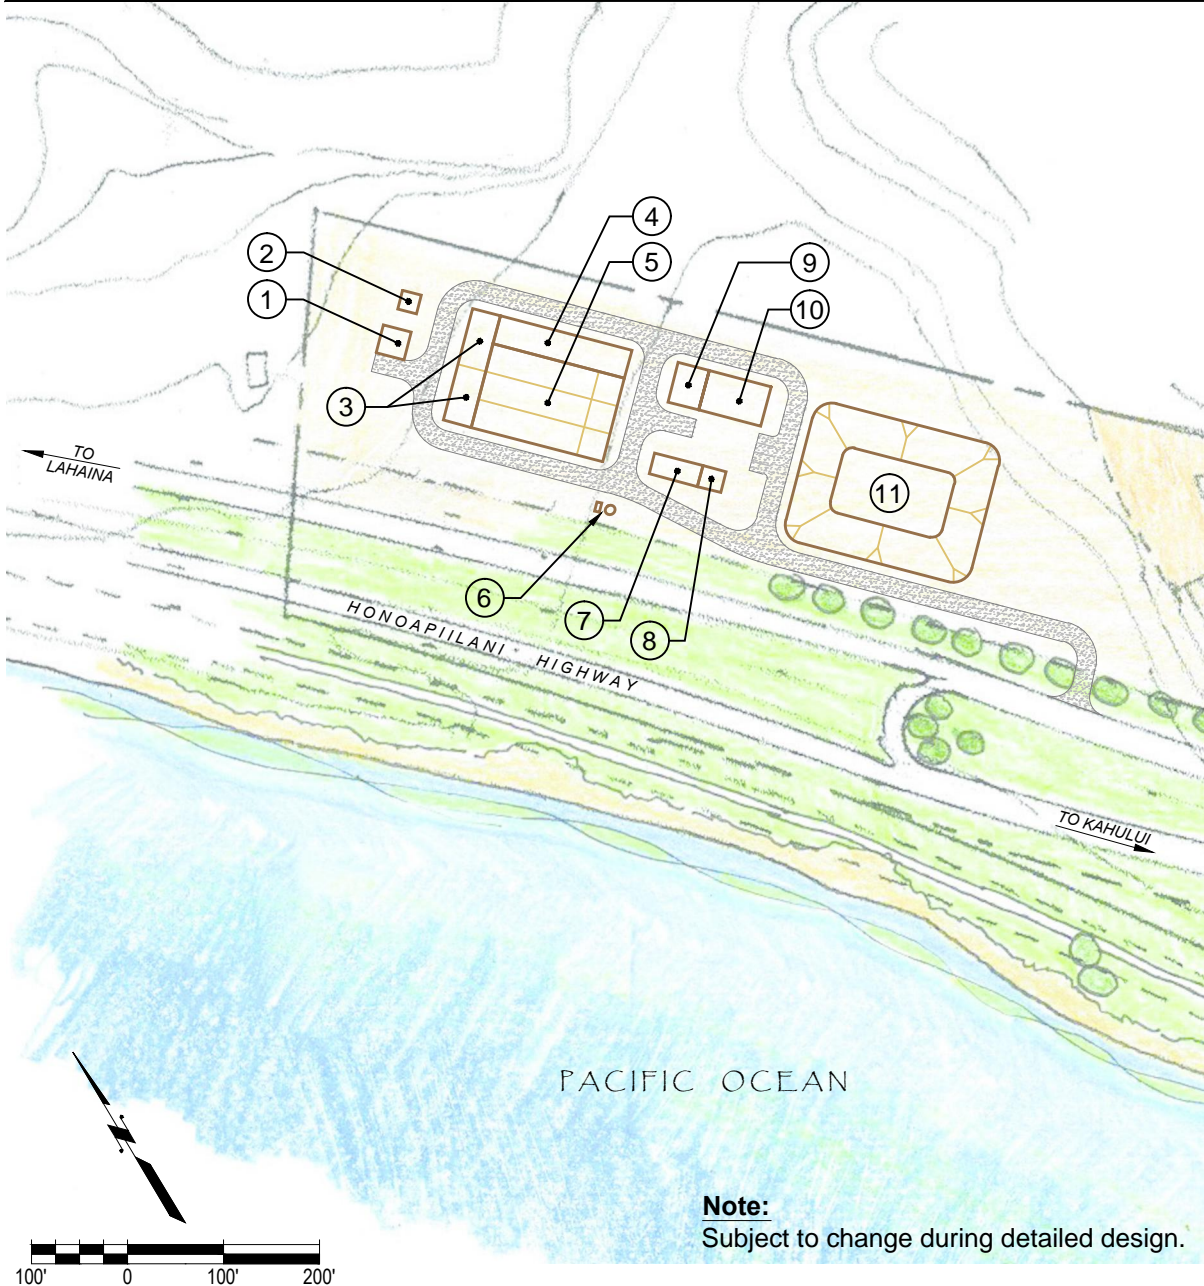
Conceptual Wastewater Treatment Plant Site Plan
